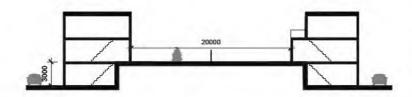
Raising ground levels between buildings to create amenity space accessed from habitable rooms above street level.
